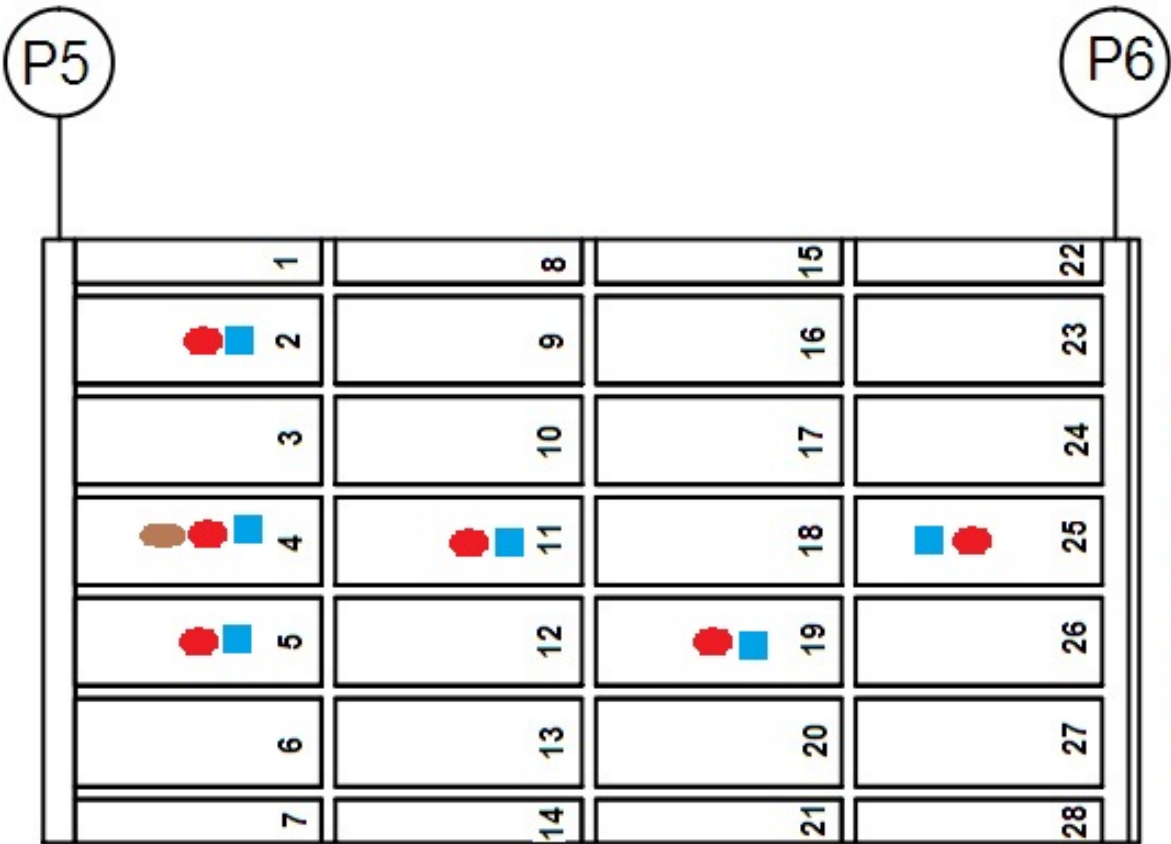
Test conducted at various locations between Pier P5 and Pier P6
